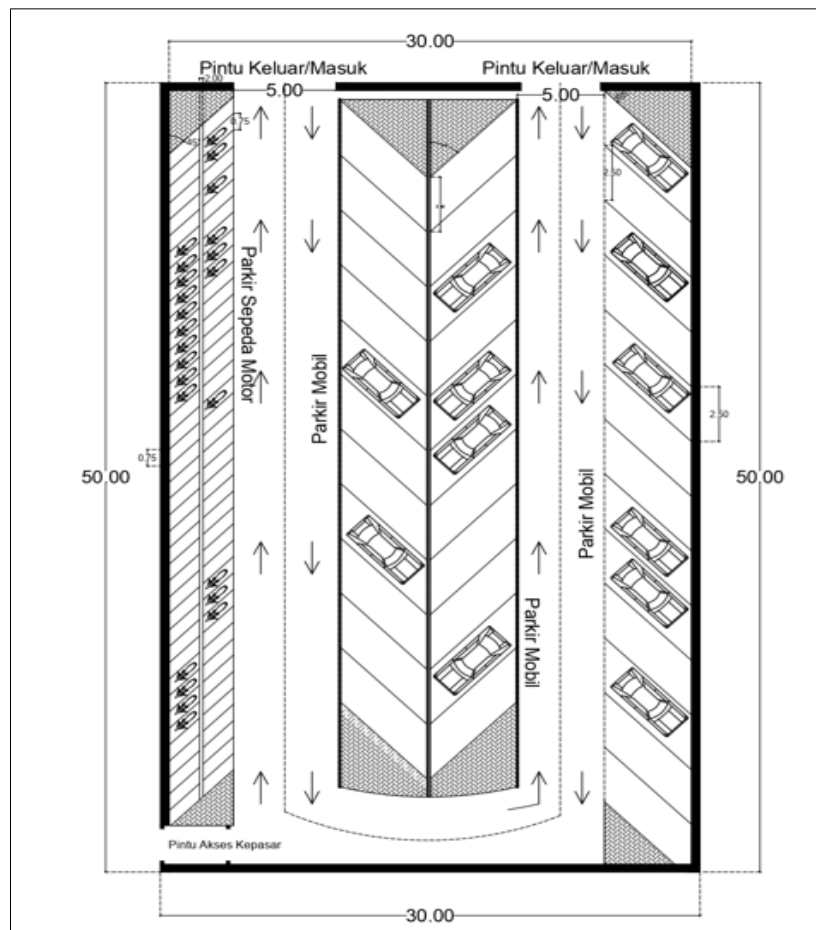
Site layout illustrating the location and spatial arrangement of parking areas within the study area.
